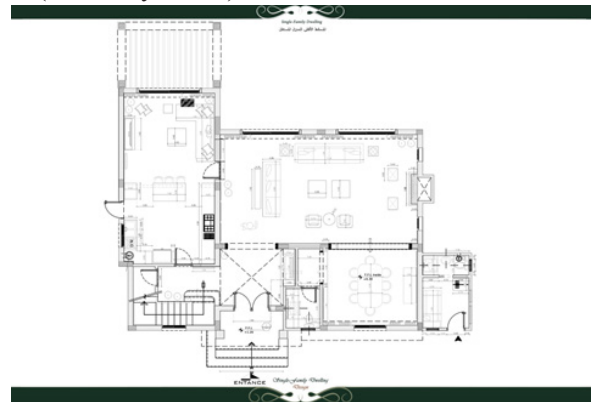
((Author, 2018)): A single-family home's ground floor plan.
